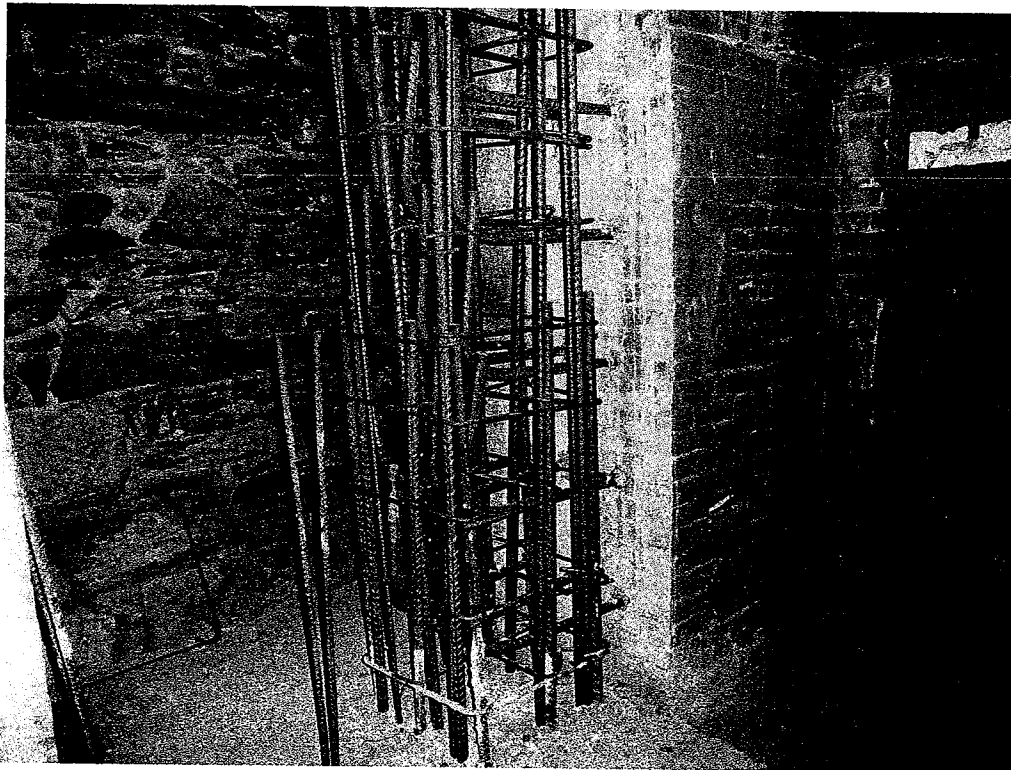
Reinforcement for new concrete piers in basement at Grid A (note dowels into the existing brick)
